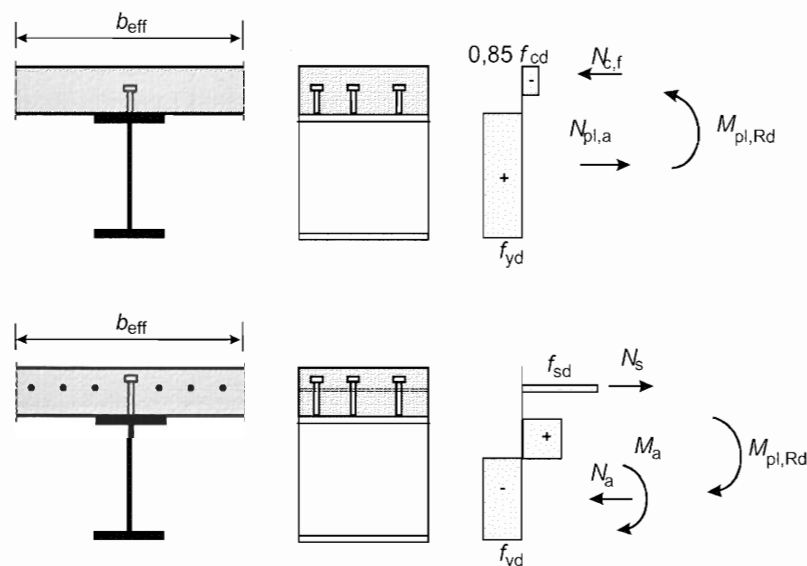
Examples of plastic stress distributions for a composite beam with a solid slab and full shear connection in sagging and hogging bending
